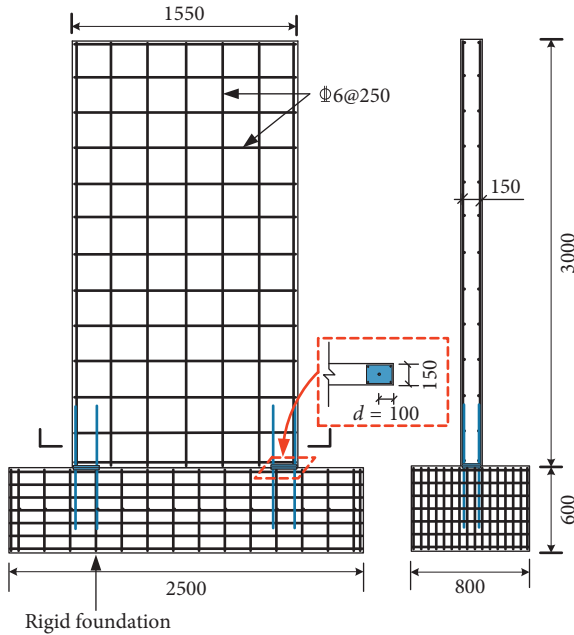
Configuration and reinforcement details of the precast shear walls (unit: mm).
